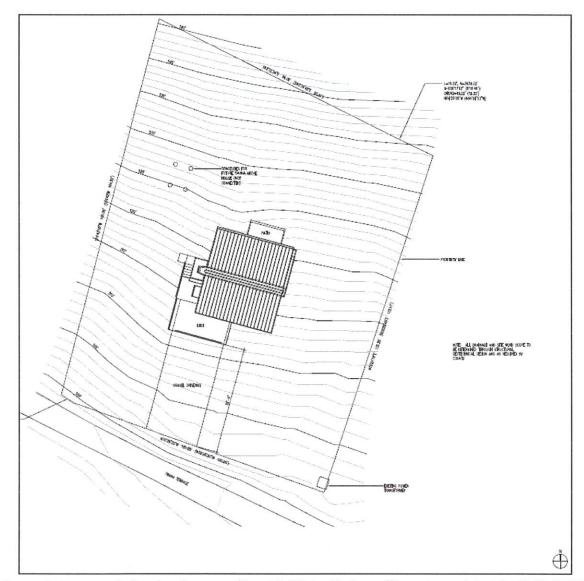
Proposed site plan (source: Sheet A100 by Ballman Khapalova, dated April 12, 2021).
